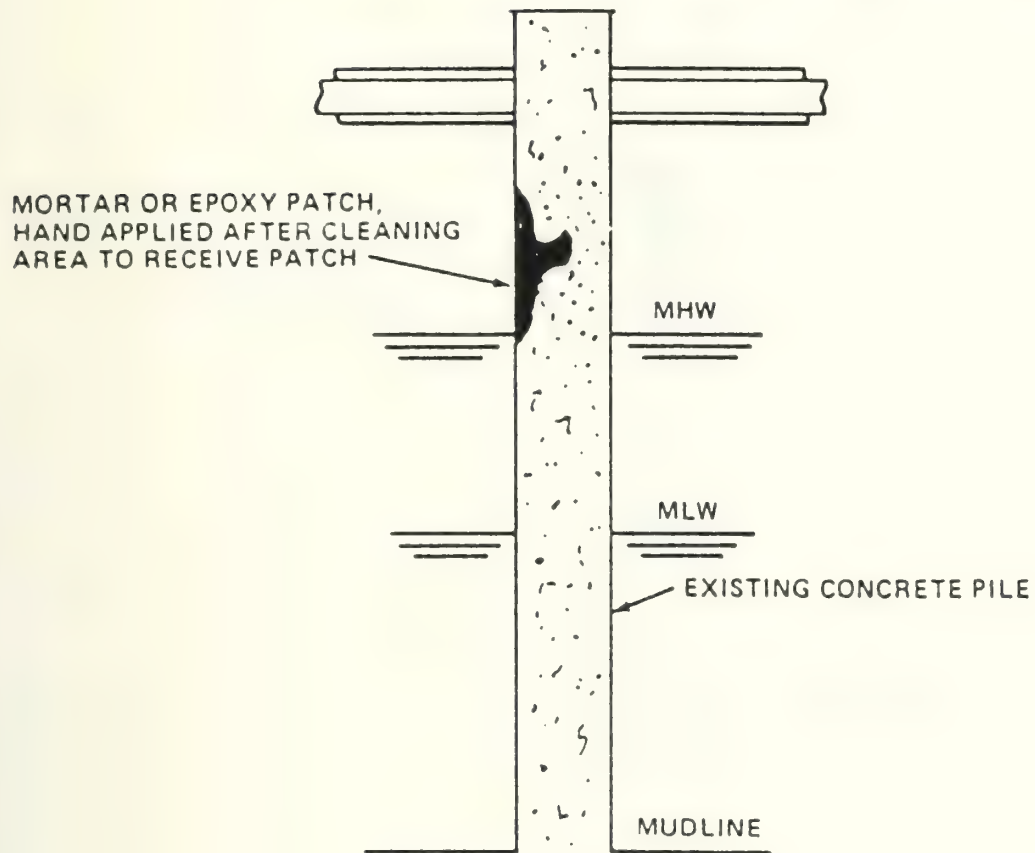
Patching Method for Repairing Concrete Piles [61]
